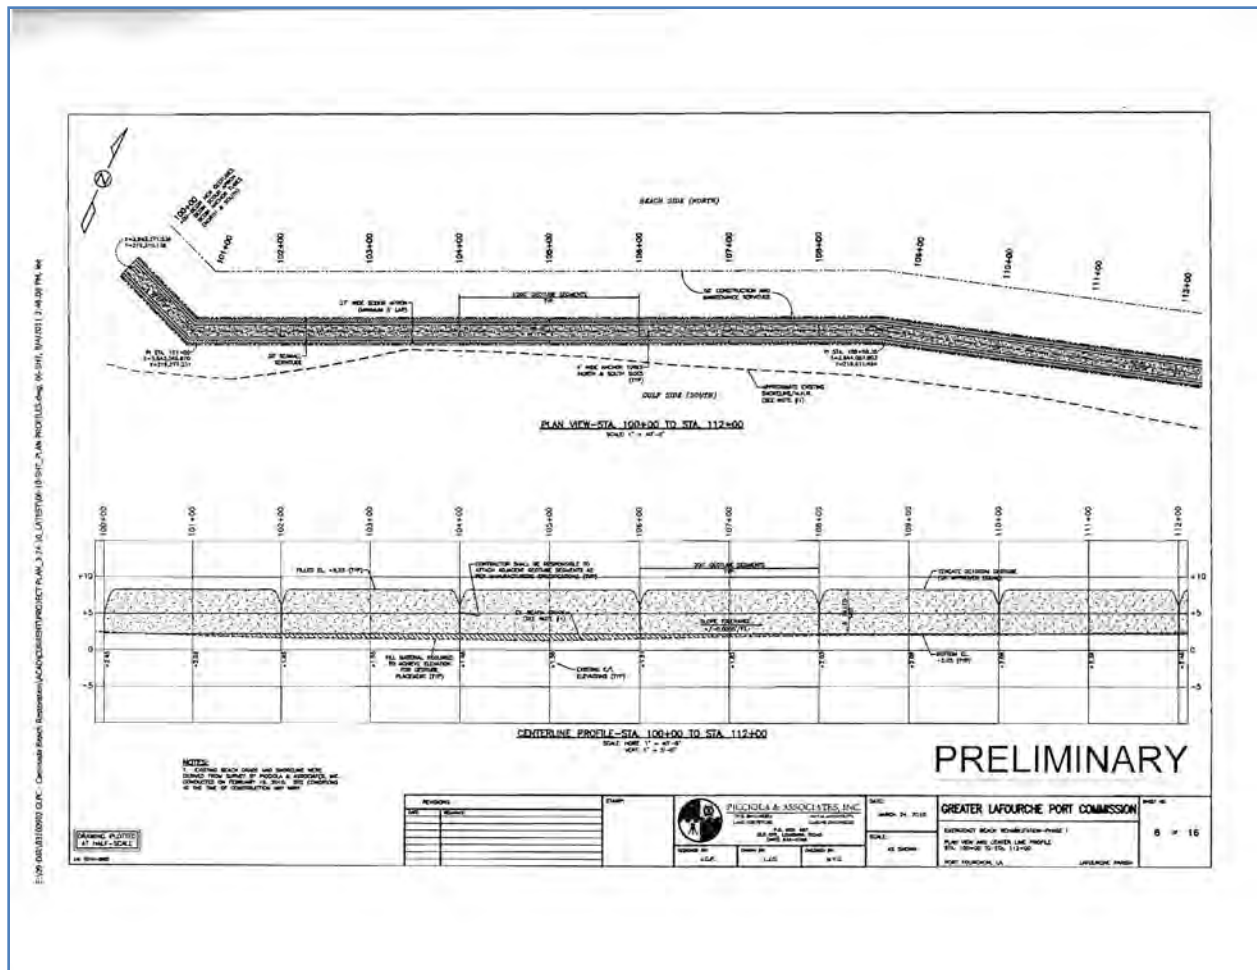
Plan and Centerline Profile Details (Picciola & Associates, 2010)
